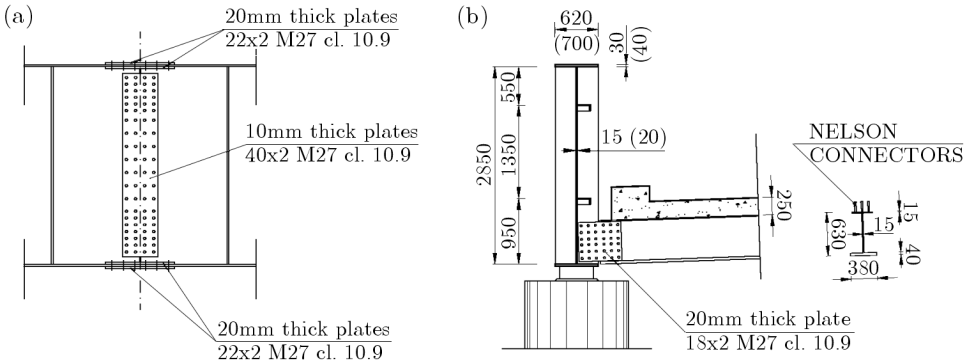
Constructional details of Zigana bridge: (a) bolted joint of the longitudinal plate girders and (b) bolted connection between longitudinal plate girders and transverse beams. In figure (b), the measures in parentheses are referred to the central plate girder (lengths in millimeters)
